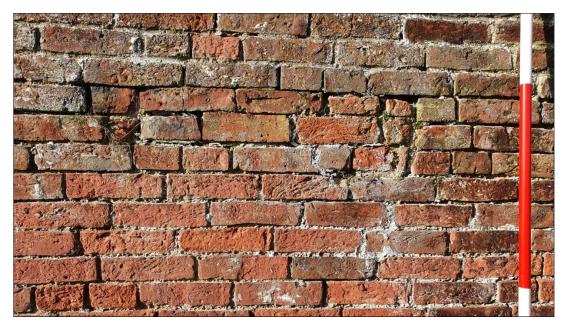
rectangular opening (414) in south-facing elevation of wall 400.
